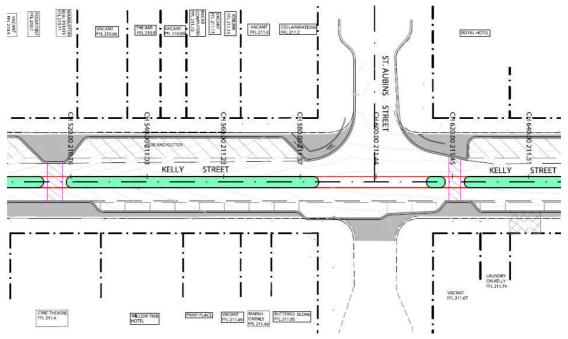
Detail Plan of the St Aubins St civil works on Kelly Street. (RHM Consulting Engineers)
